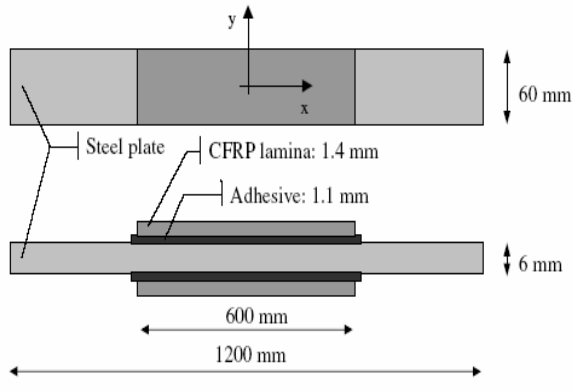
Double side reinforcement of a steel plate (specimen R1 in Table 1).
